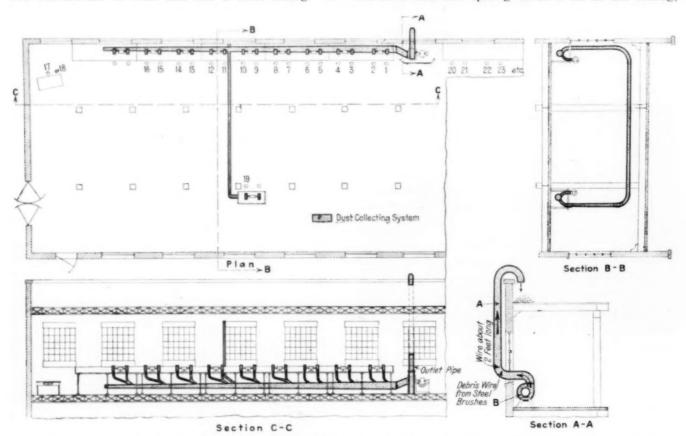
PLAN, ELEVATION AND SECTION OF OLD SATIN-FINISH DEPARTMENT, SHOWING THE DUST-COLLECTING SYSTEM
